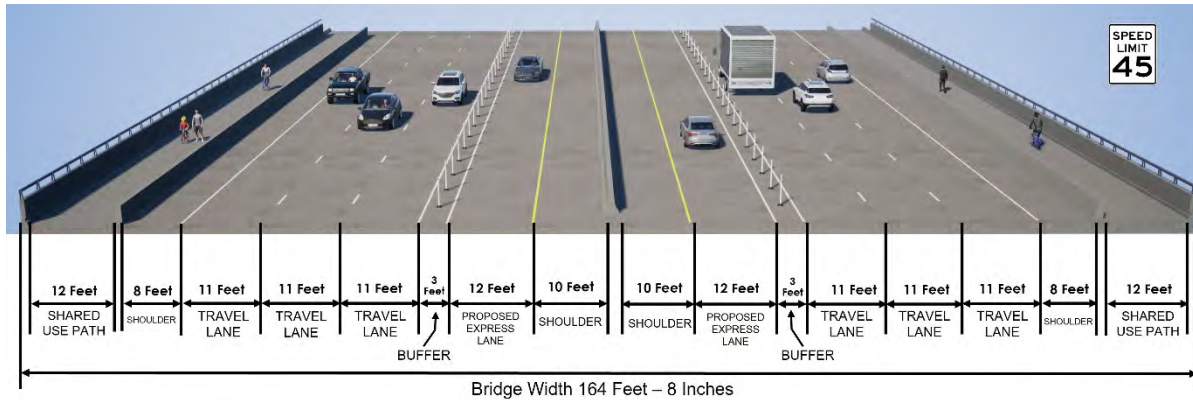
Preferred Roadway Typical Section: DeSoto Bridge
